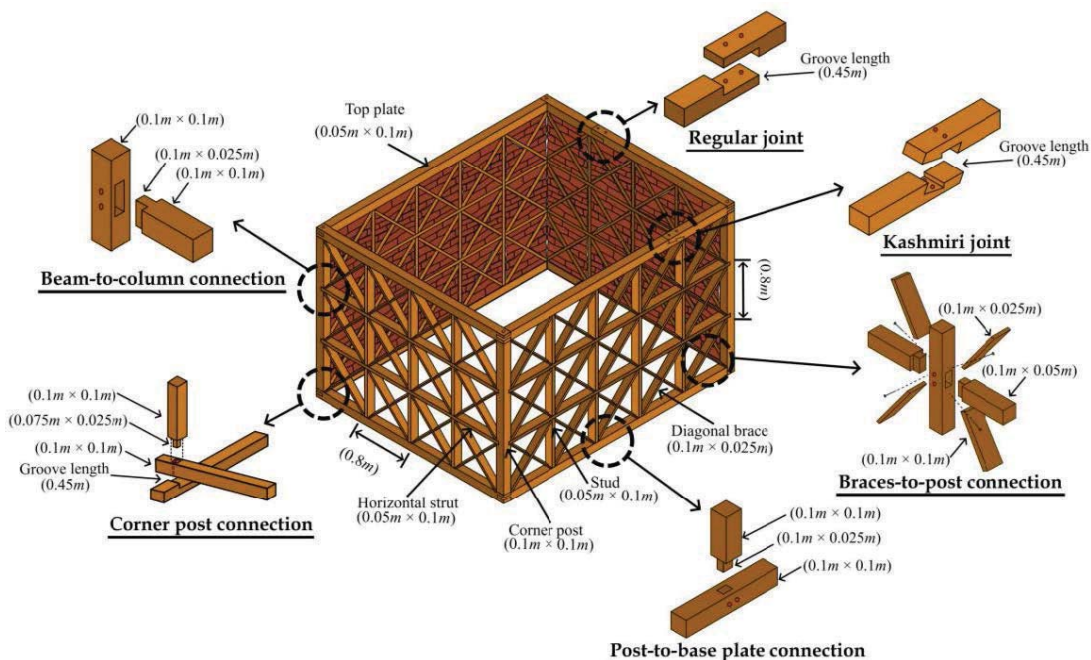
Typical sketch of the load-bearing system of Dhajji-Dewari buildings
